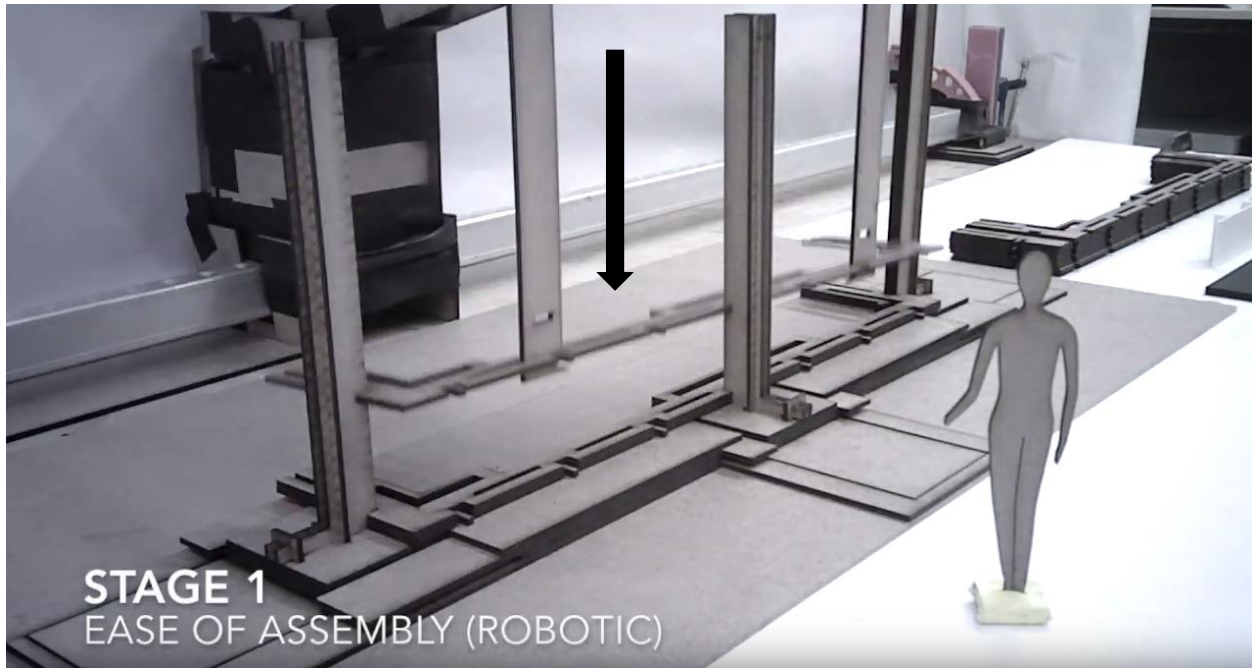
Stage 1: Ease of Assembly - Automated (Source: Demonstration photo). The photo shows automated assembly of cut parts on-site by z-axis stacking.
